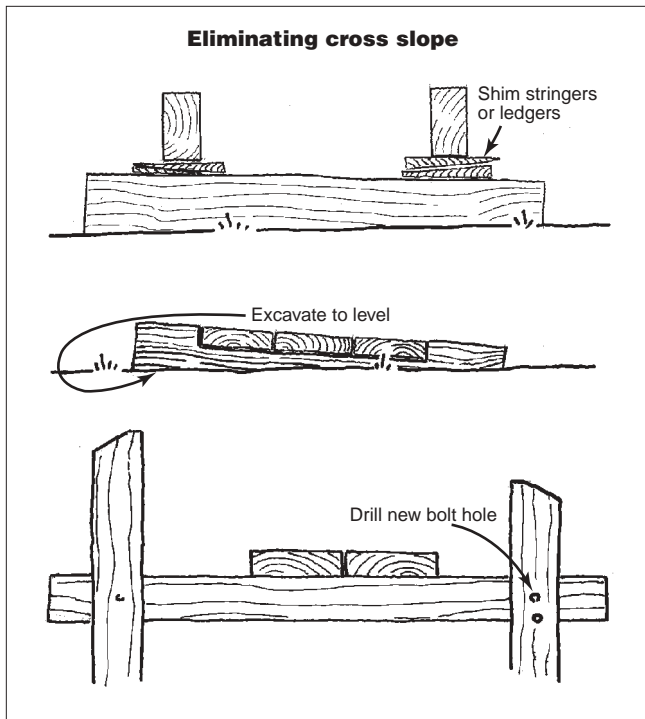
Eliminate cross slope with shims, by excavating the high side of sleepers, or by drilling new bolt holes on the ledgers.
